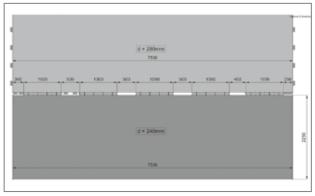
Schöck Isokorb® T type K-E, K-T: Geometry of the interior floor slab and balcony
